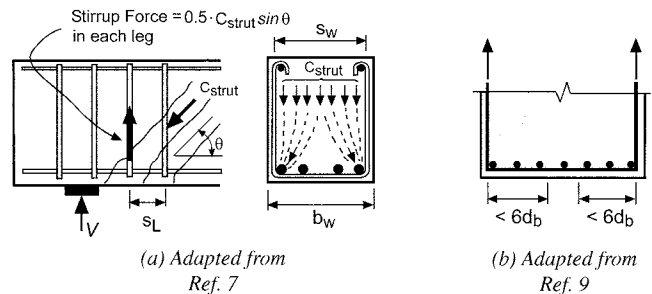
Force flow analogy in diagonal strut toward shear reinforcement legs: (a) spreading model; and (b) effective strut anchorage width for truss modeling.
